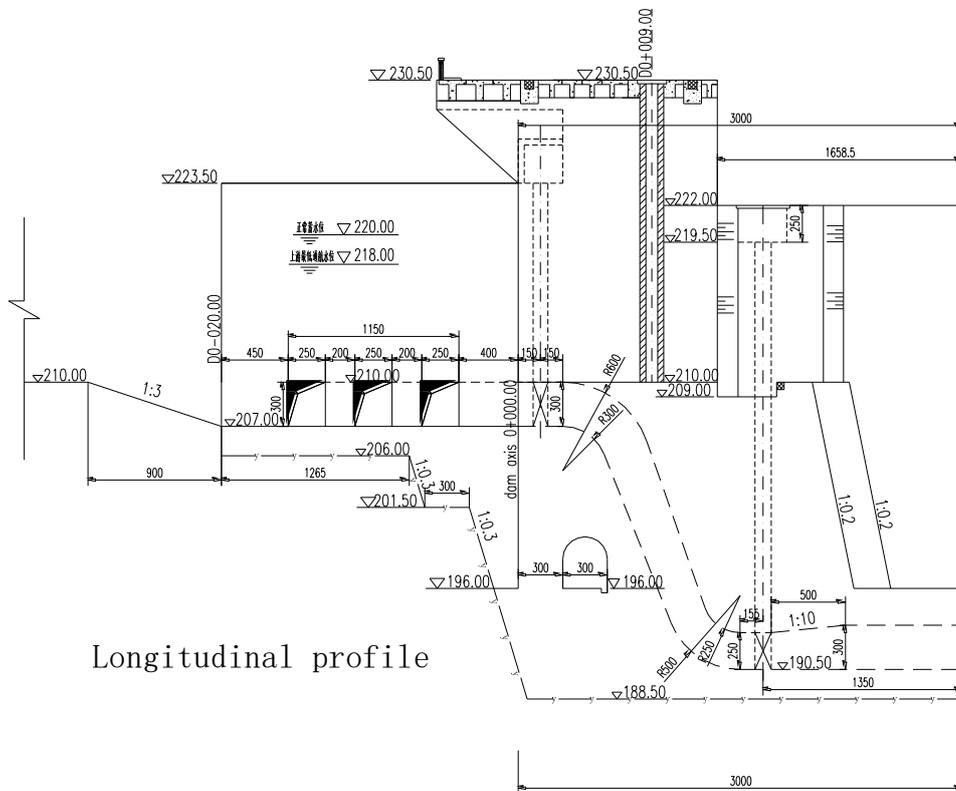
Initial layout of the in-chamber bottom longitudinal culvert filling and emptying system of the Sanakham lock (Unit: Elevation m, Length cm)
